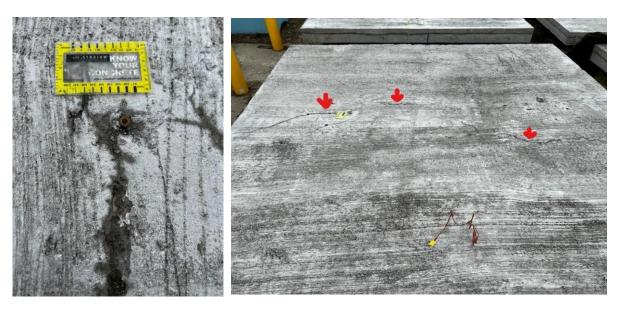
Cracks on Overlay Slab 7 (E-I)
